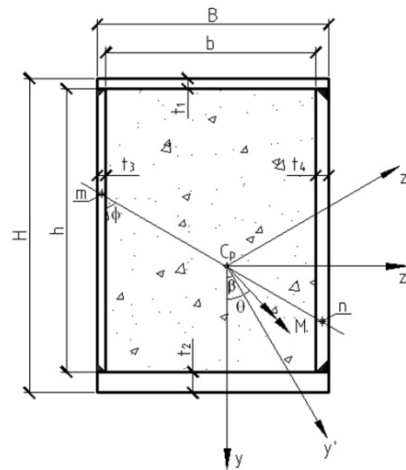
Cross section of rectangular CFST beams with unequal wall thickness subjected to pure bending
